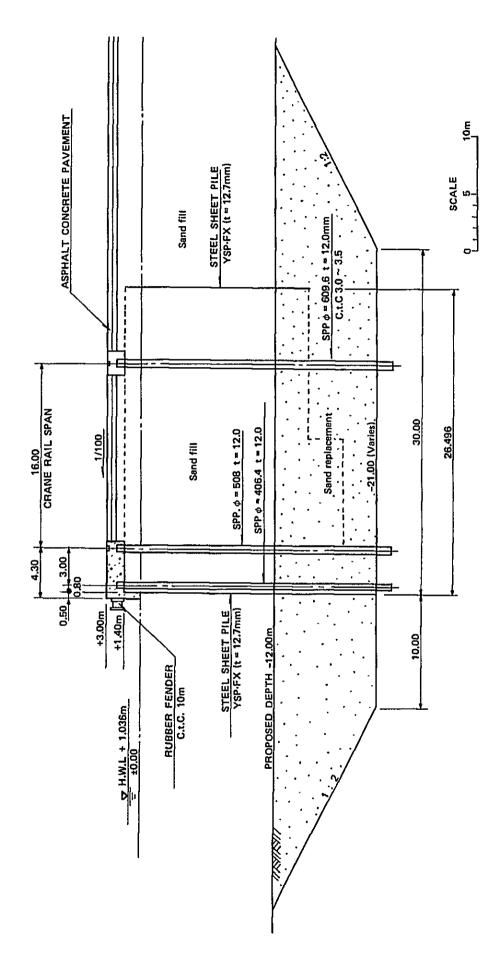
Container Berth Quay Wall (Steel Sheet Pile Cellular Cofferdom Type)
